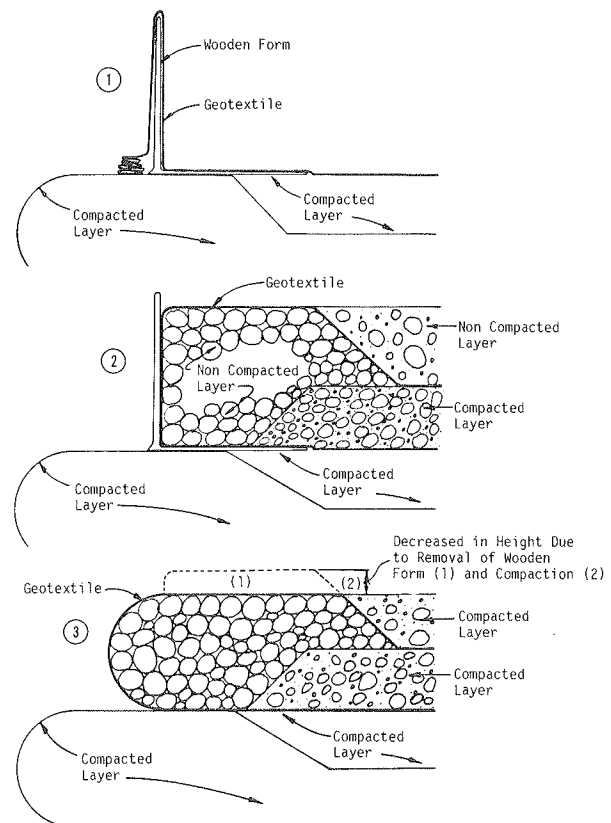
Geotextile reinforced wall construction procedure used in Europe.
